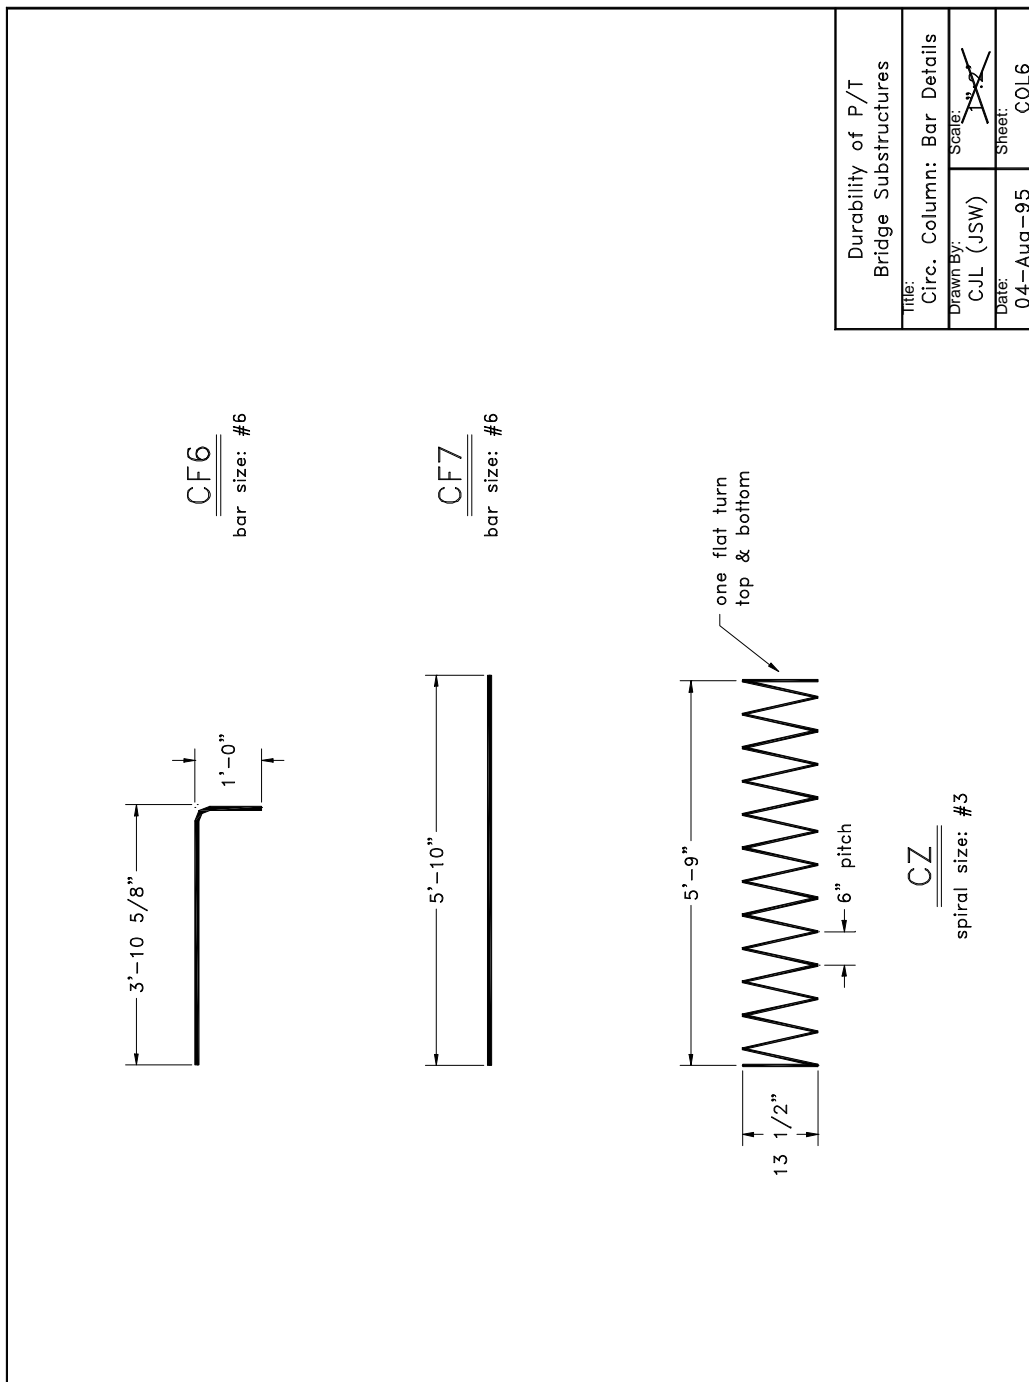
Sheet COL6: Column Reinforcing Bar Details
